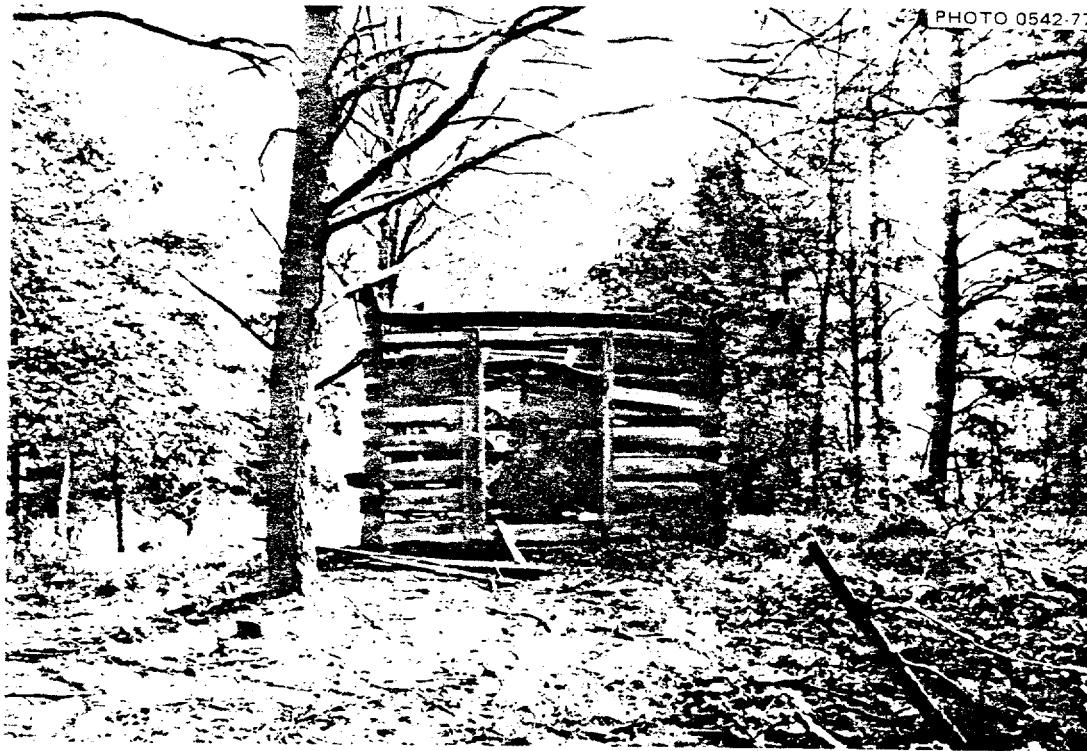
Front Elevation of Structure 32B, a Log Crib.
